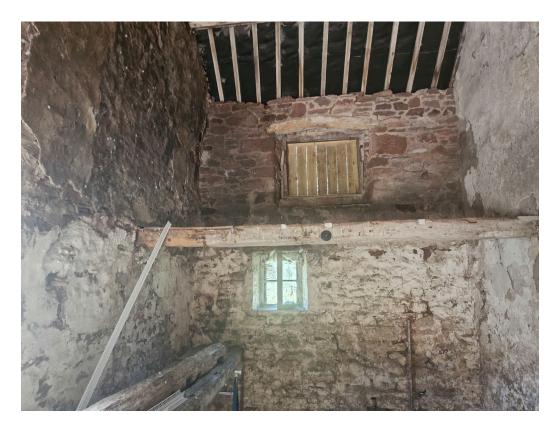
VIEW ON INTERNAL FACE OF REAR WALL
